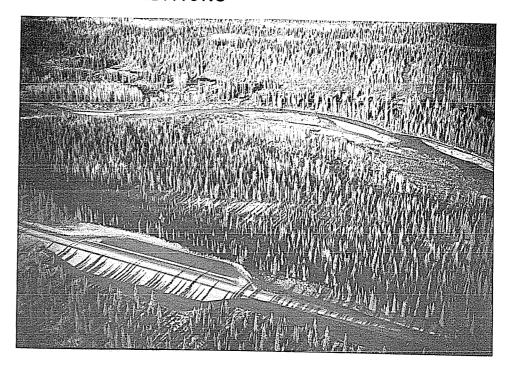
D.I TYPICAL ROAD PULLOUT ON THE PARKS HIGHWAY (A PAVED ROAD WAY)
